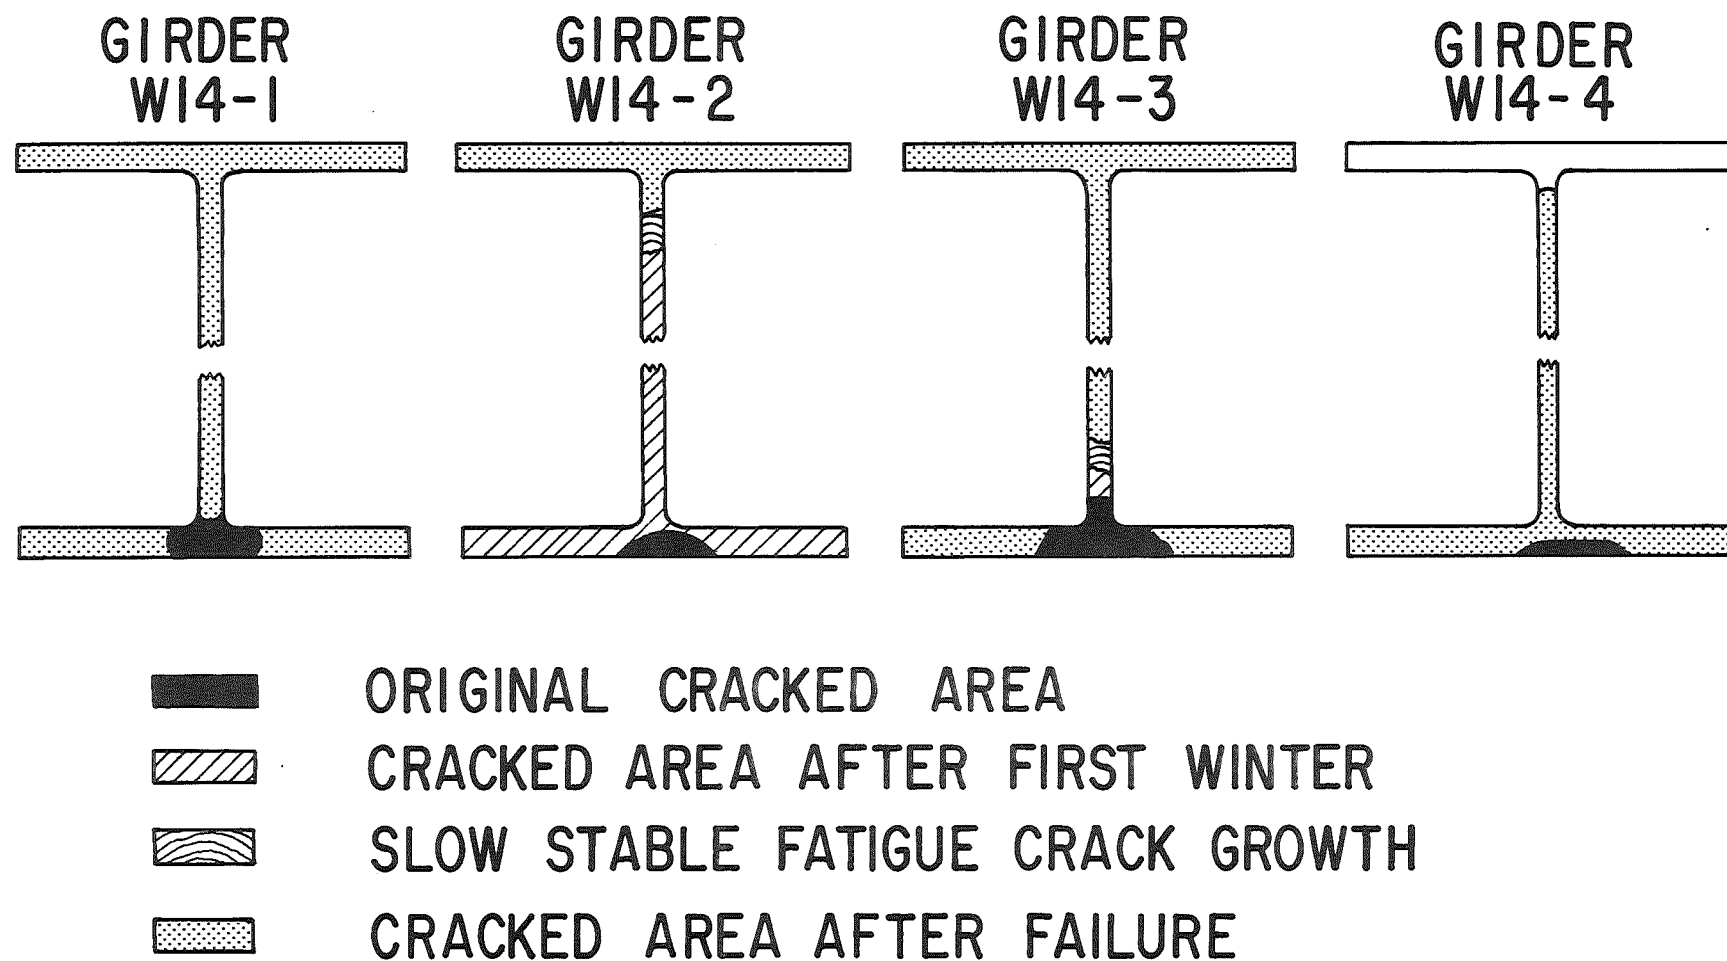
CONDITION OF THE FAILED GIRDERS OF KINGS BRIDGE
